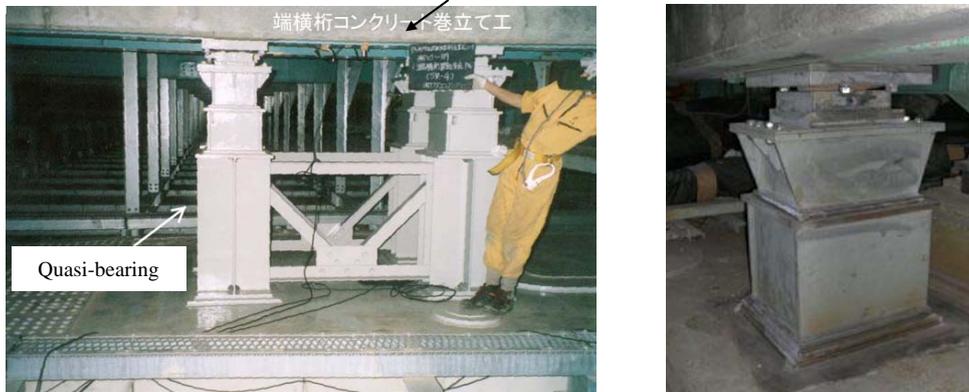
Quasi-bearings and the concrete lining method of the end crossbeam
